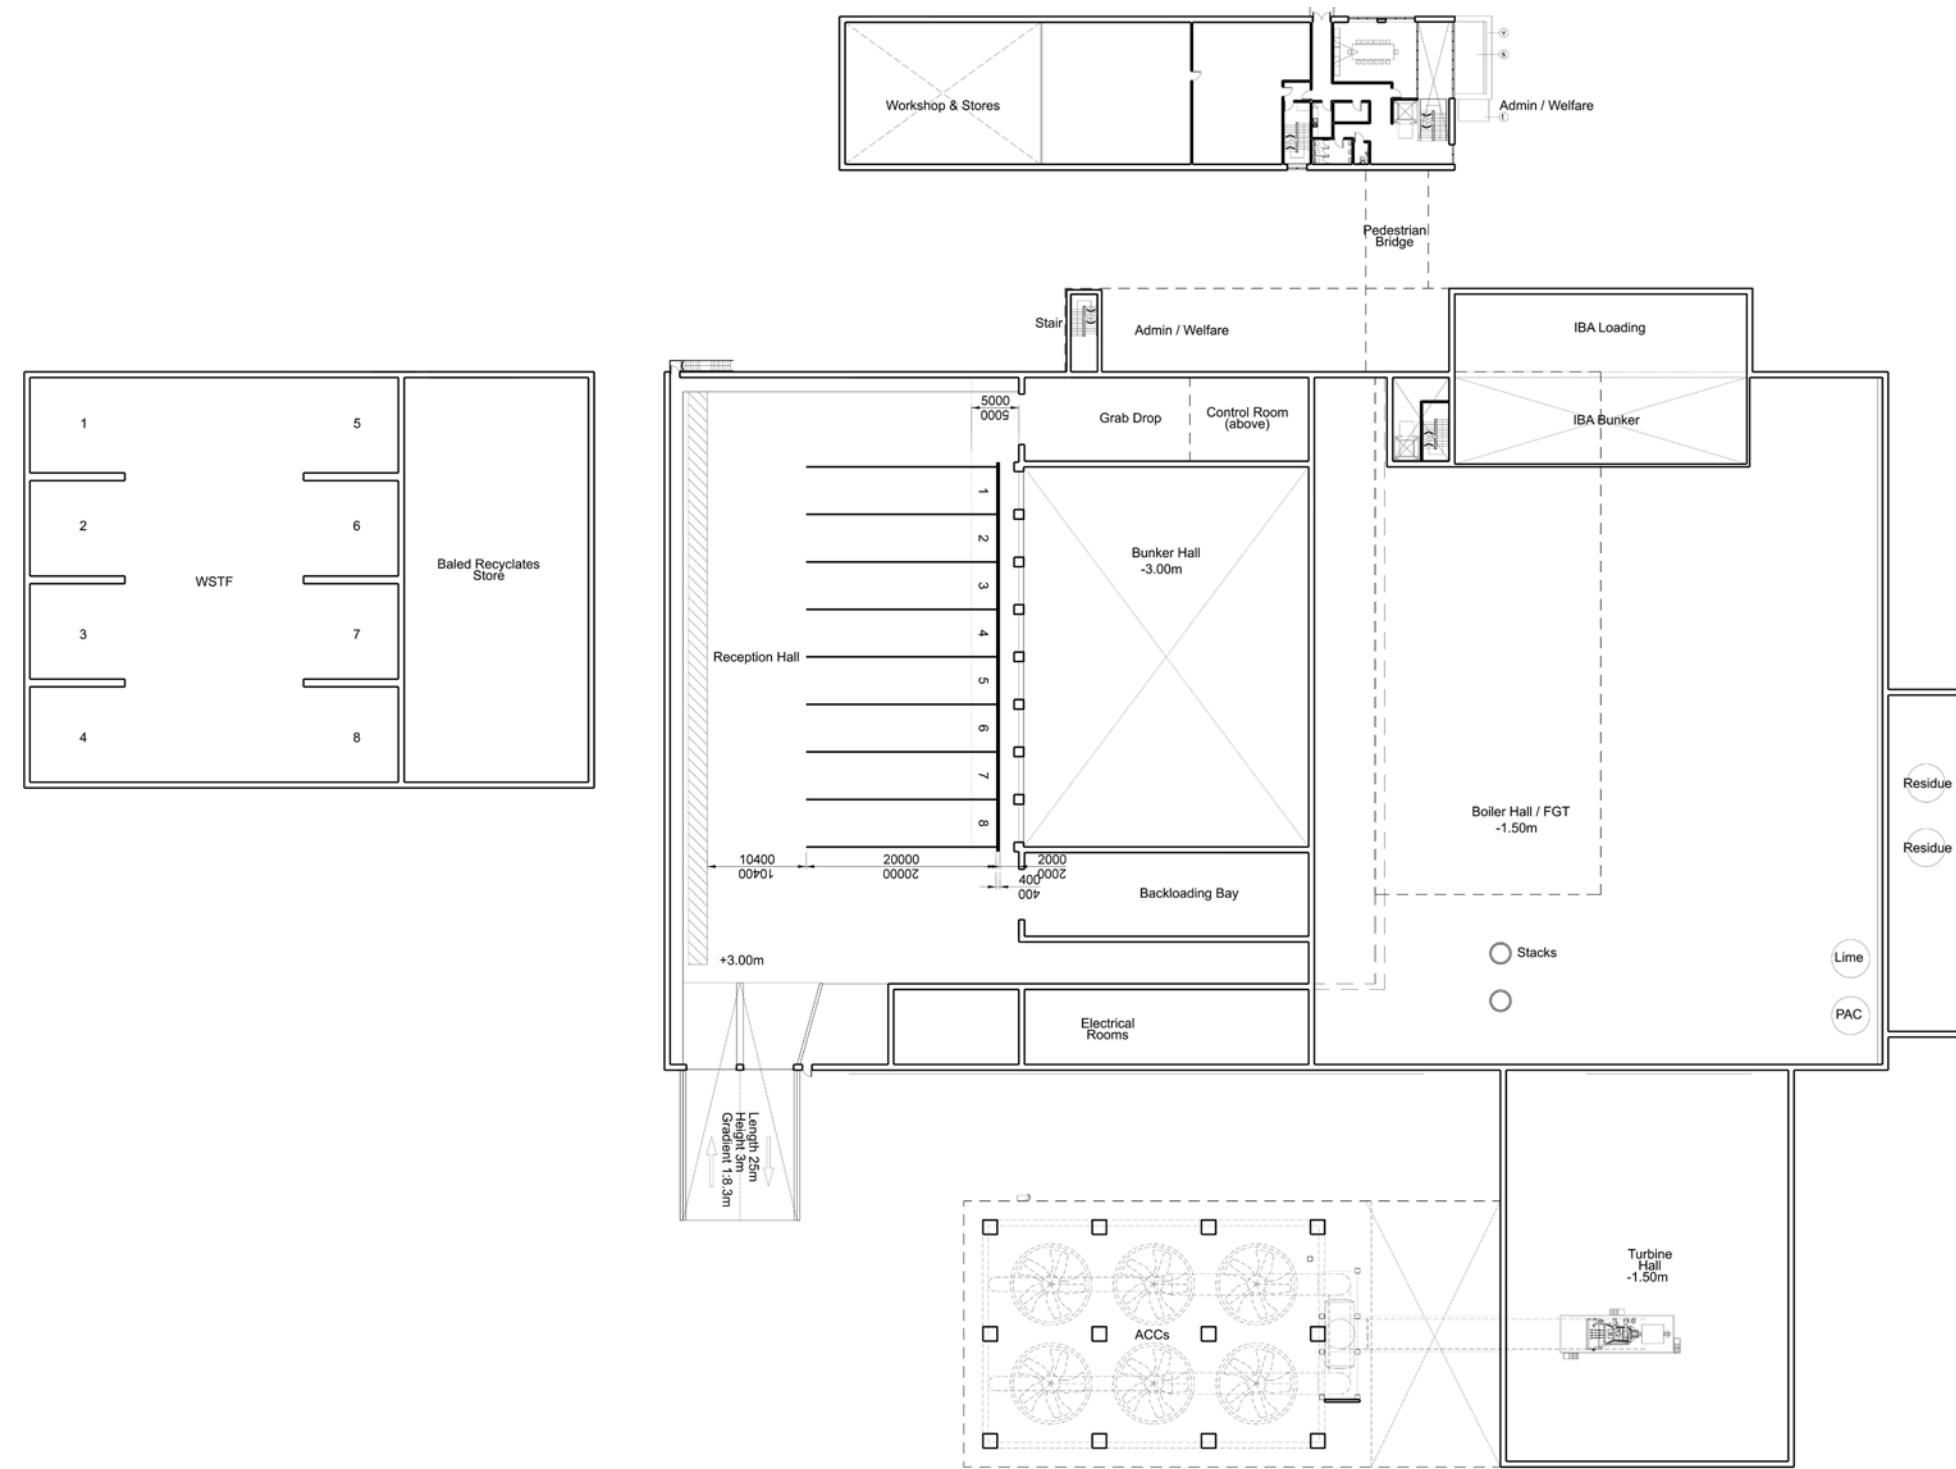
Proposed ERF & WSTF ground level plan – extract from drg PL112
